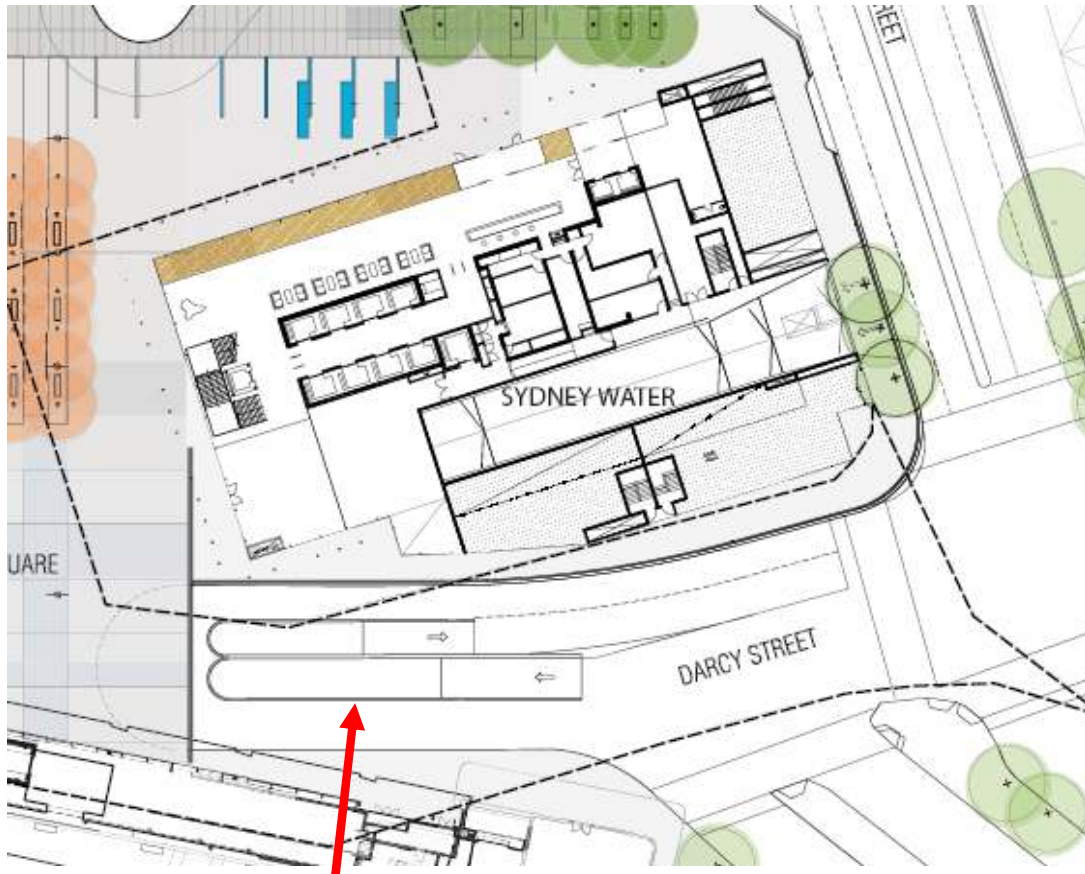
Extract from the Preliminary Assessment for the Civic Place site: Grocon Pty Ltd proposed dive structure adjacent to Sydney Water site to the north. (Note: The Sydney Water building depicted in this image does not correspond with the subject proposed building on this site. This illustration is provided to demonstrate the access to the Grocon Pty Ltd development of Civic Place).
